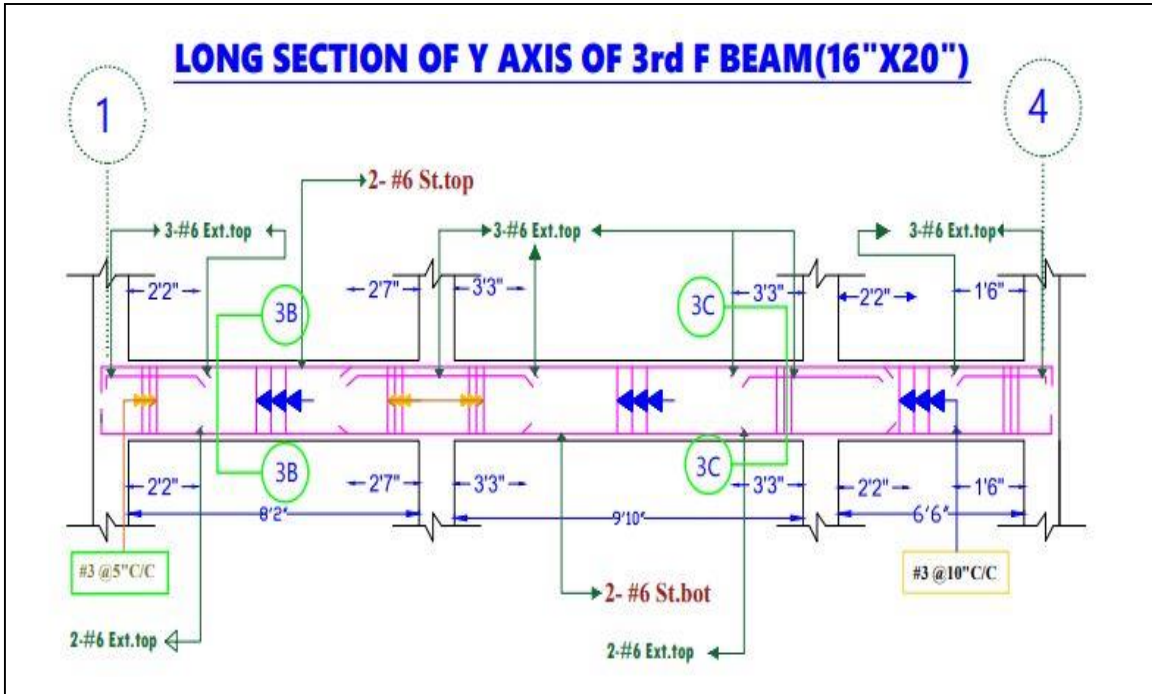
Beam Detailing & Cross Section of Y-axis
